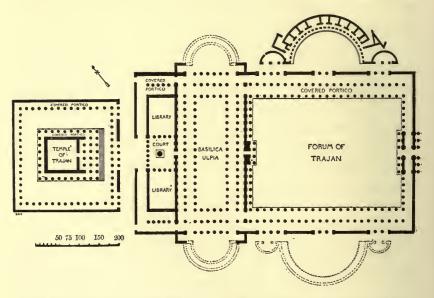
Rome: Forum, Basilica, and Temple of Trajan. Built about 110 A.D. Restored plan.
